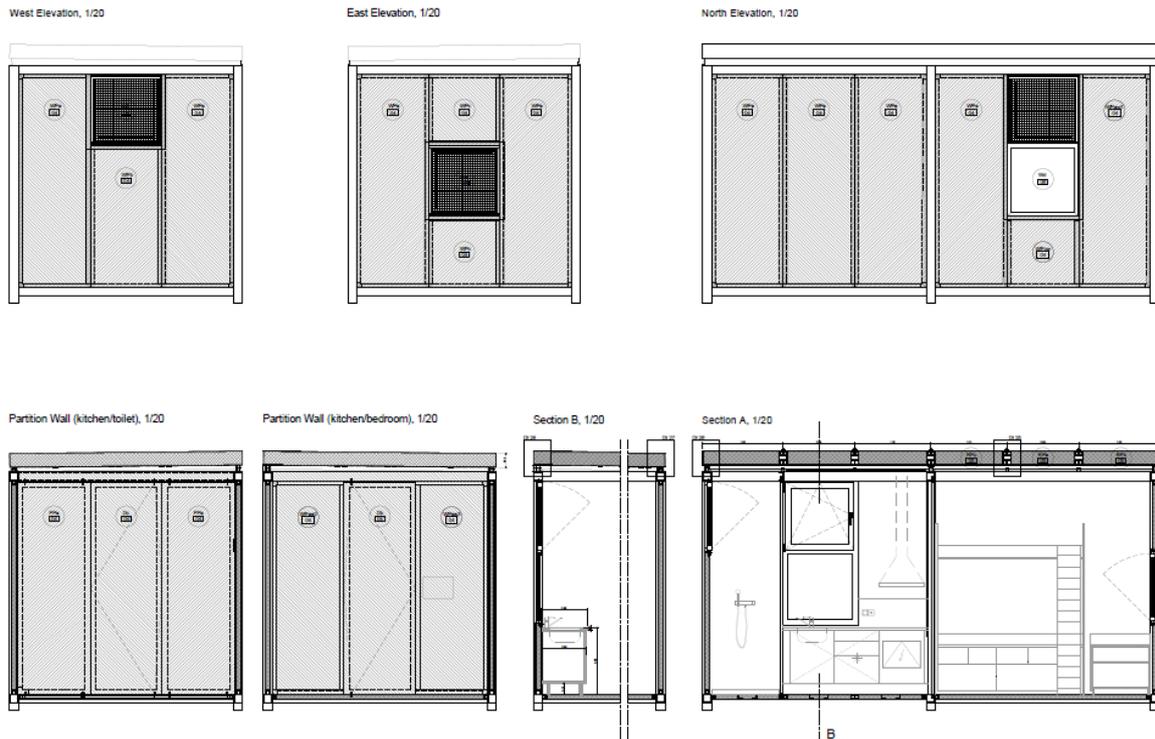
Elevations and Section: Windows's arrangement in the T0/1 shelter
